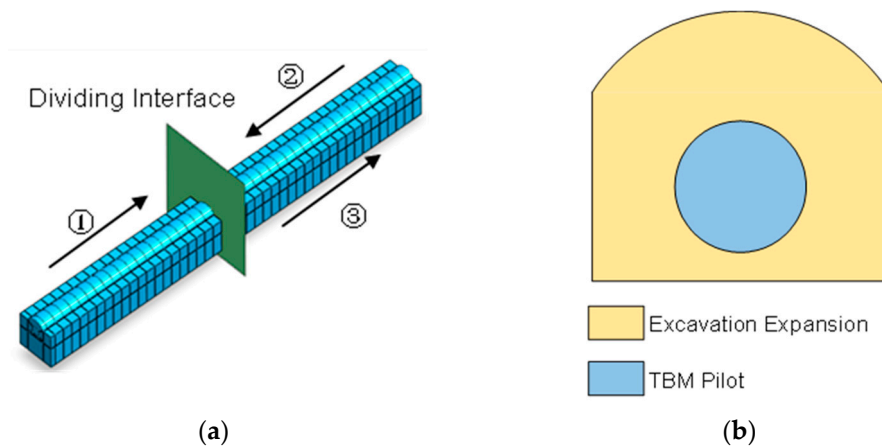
Schematic diagram of the construction process and pilot tunnel: (a) schematic diagram of the construction process, and (b) schematic diagram of the pilot tunnel.
